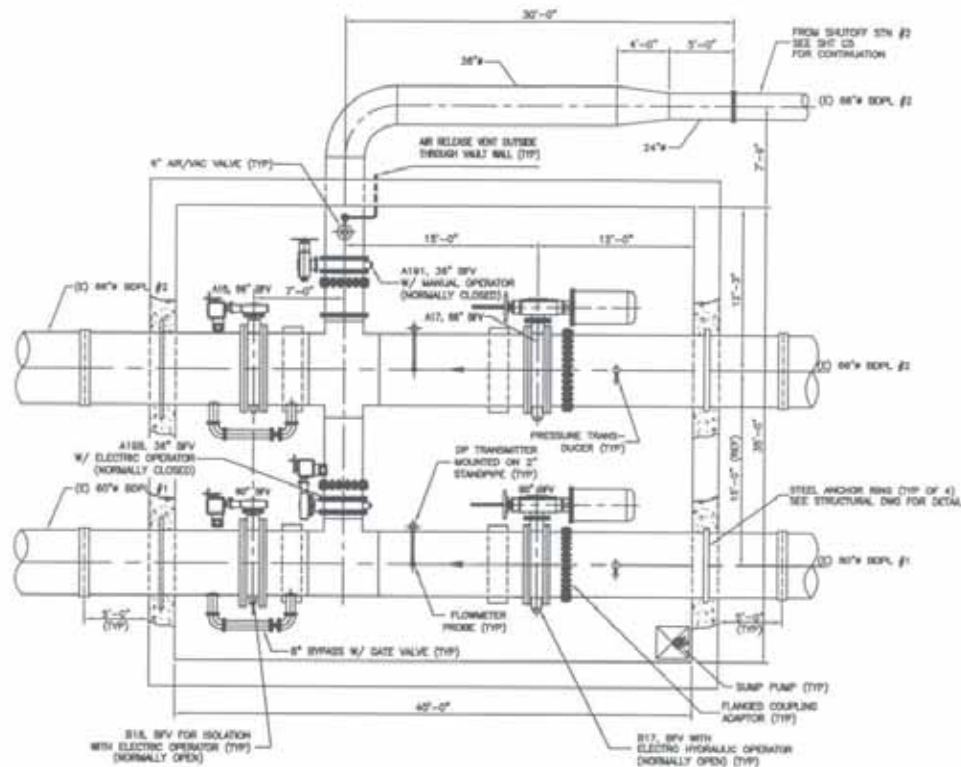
Example of a Vault Box with Cross Connection Piping and Shut-off Valves
